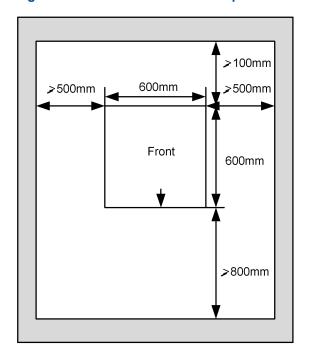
Concrete Base Size Requirement—For Stacked Cabinets
